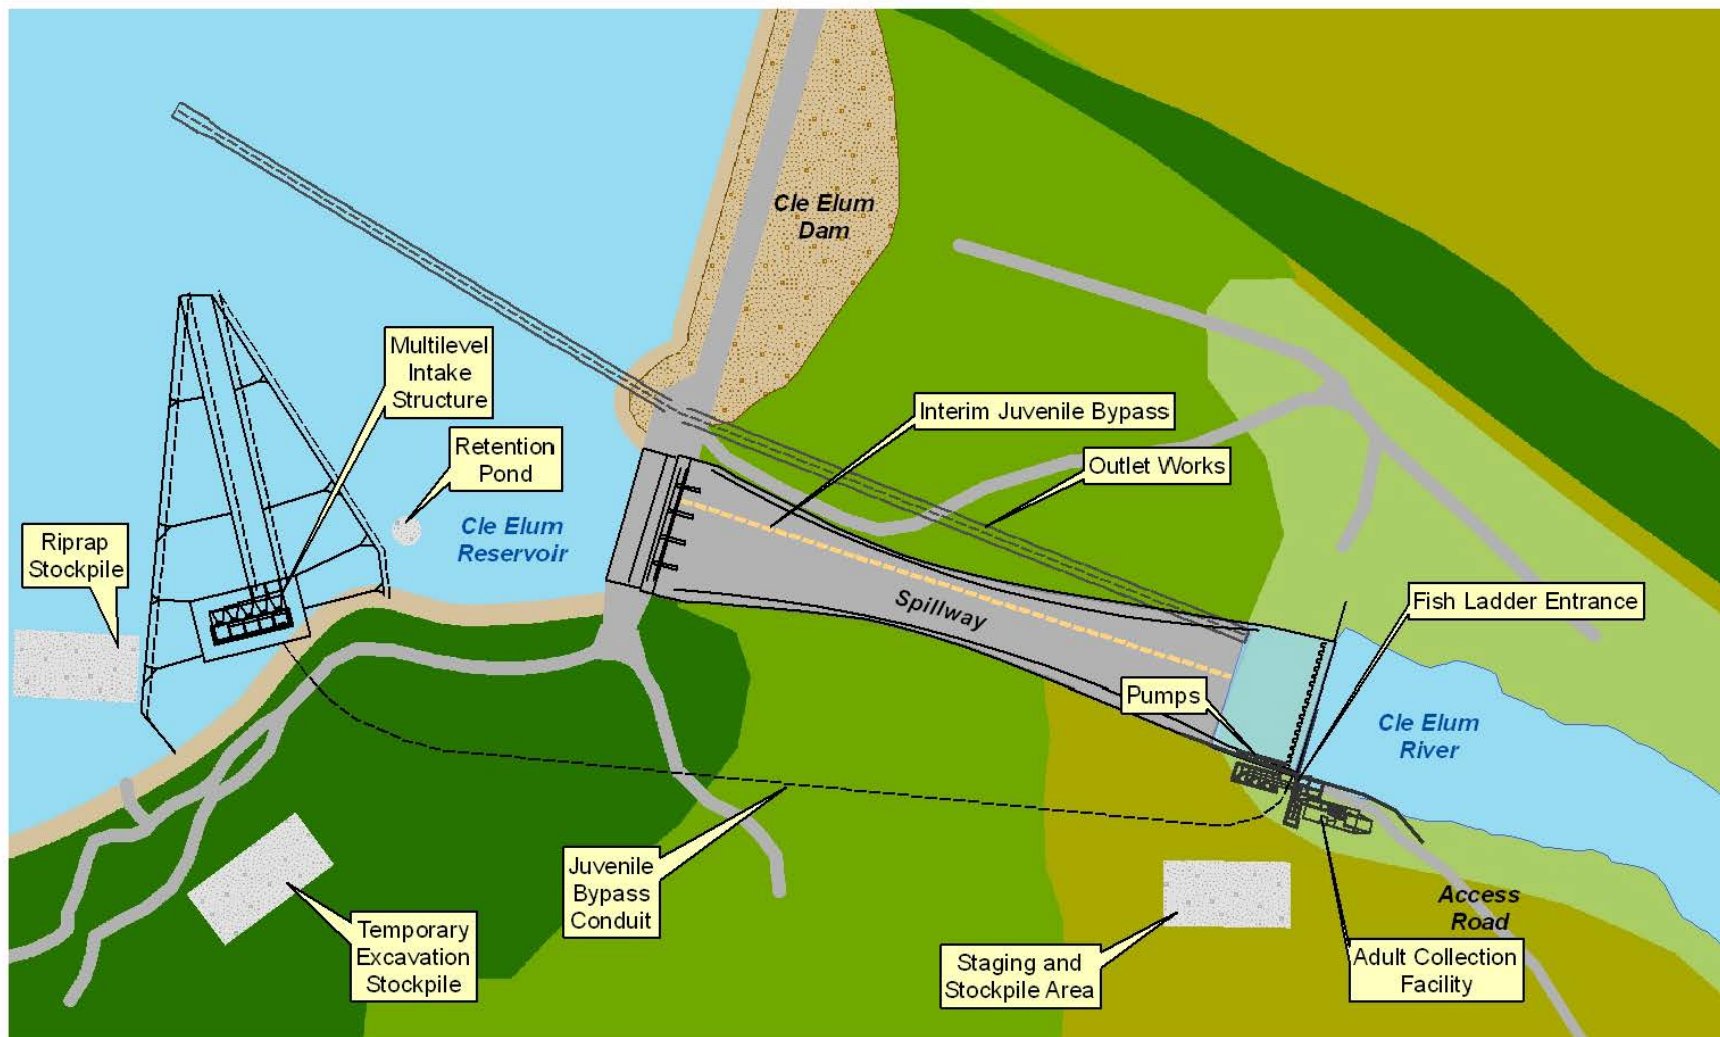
Alternative 3 - upstream and downstream fish passage facilities
